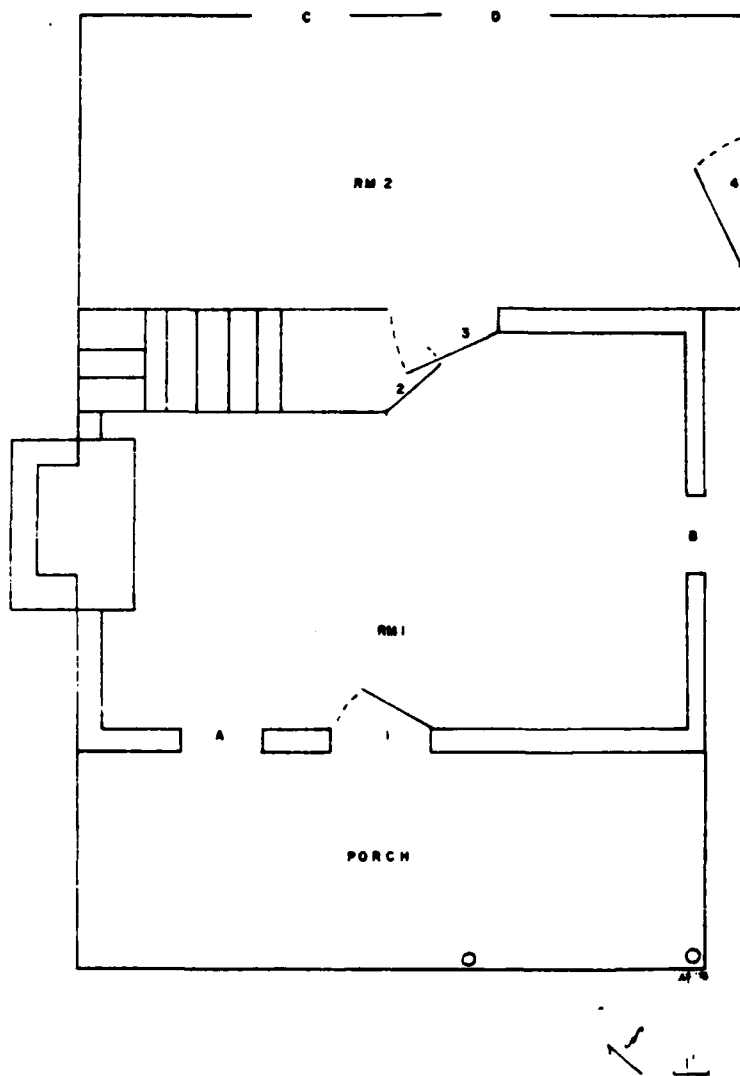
Floor plan Building 1, Rooms 1 and 2, Tract 301.
